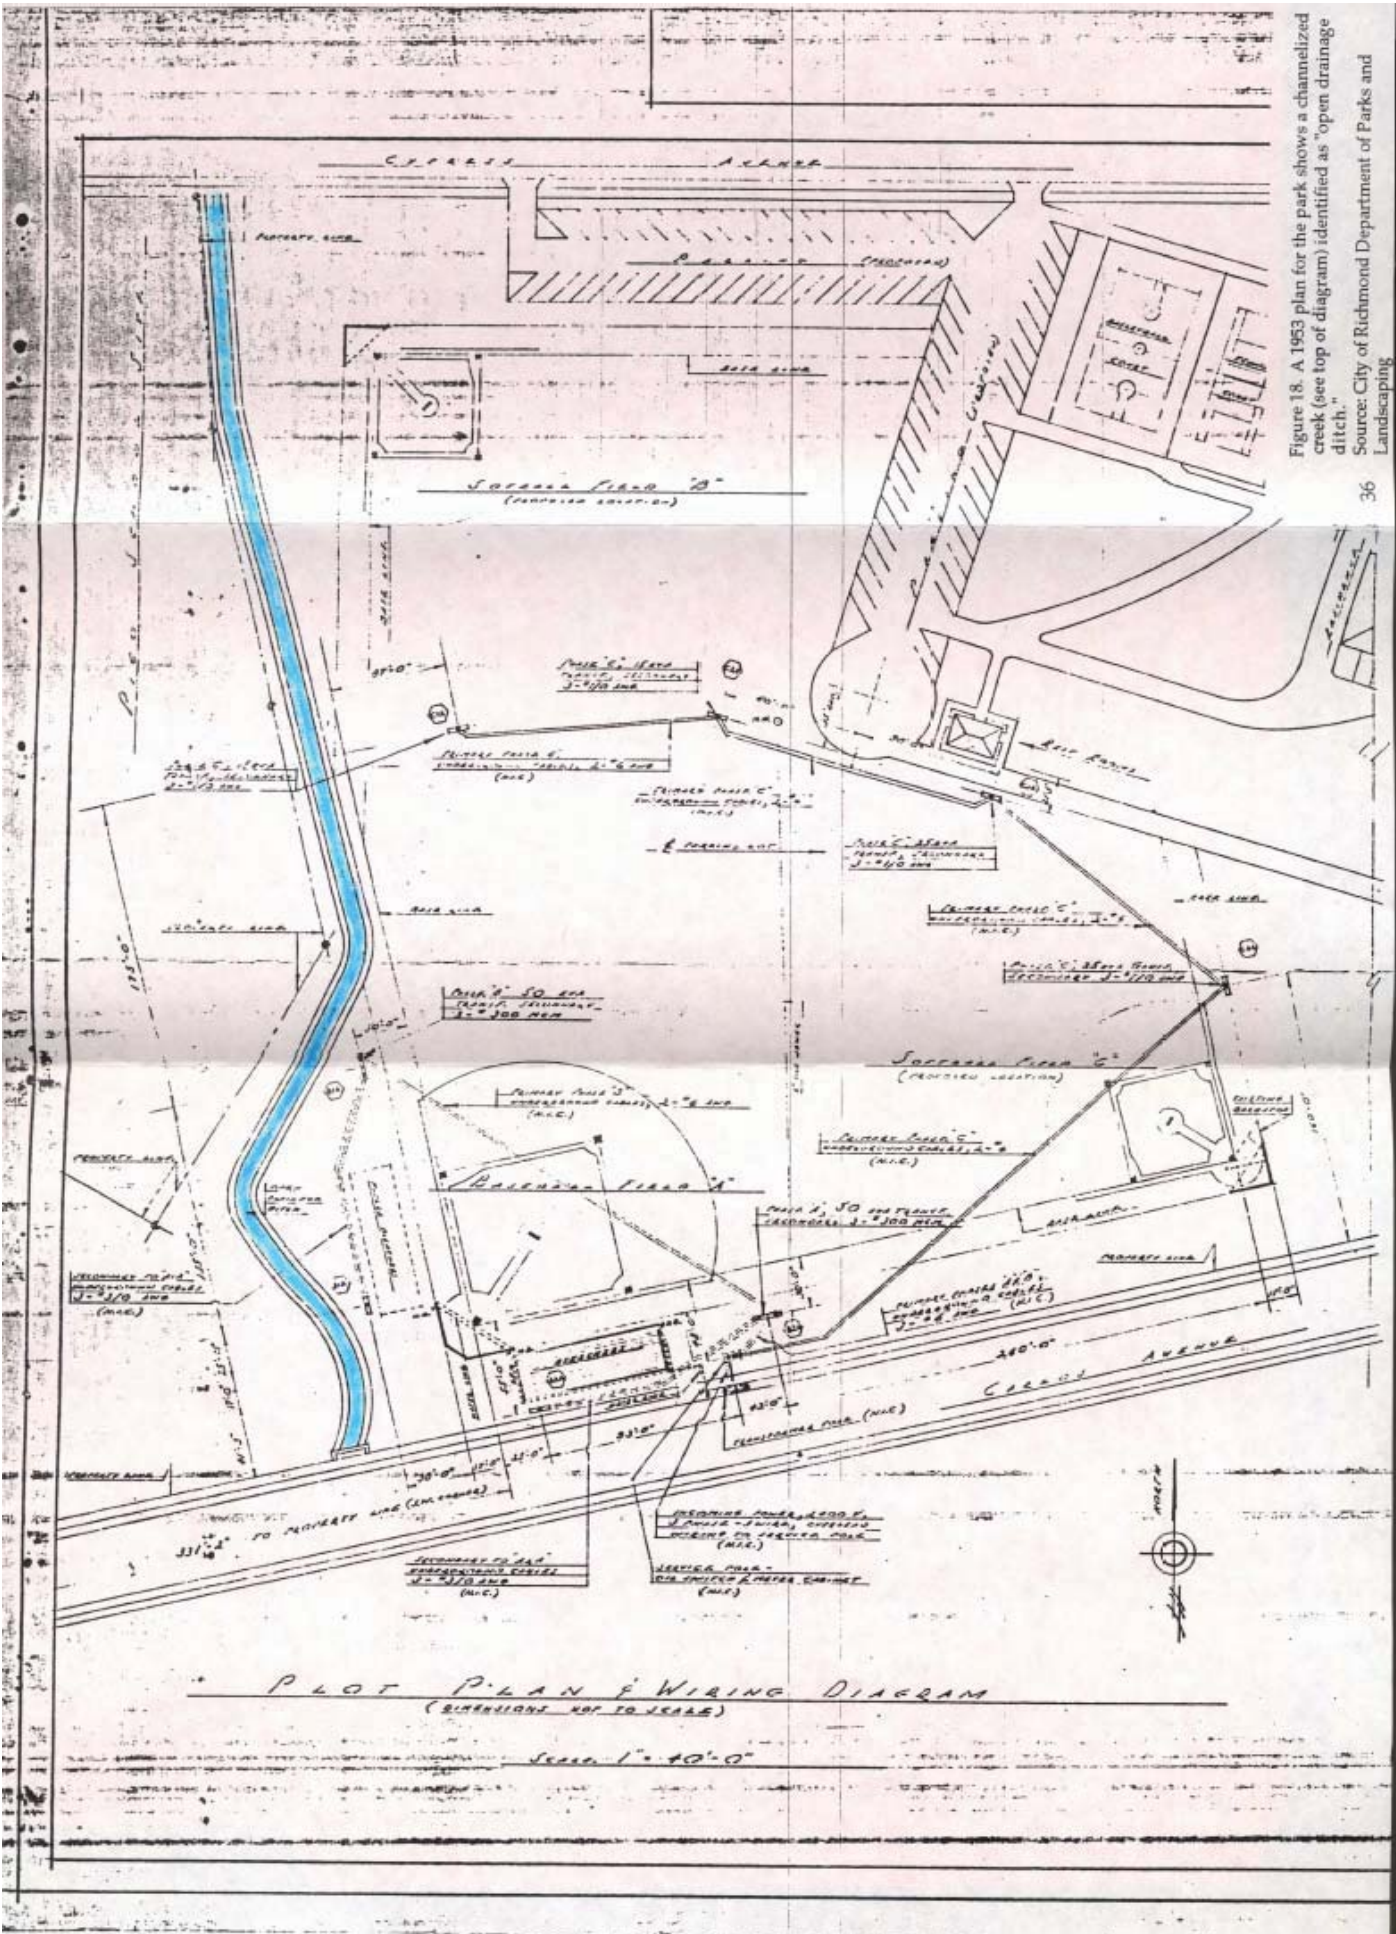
A 1953 plan for the park shows a channelized creek (see top of diagram) identified as "open drainage ditch."
